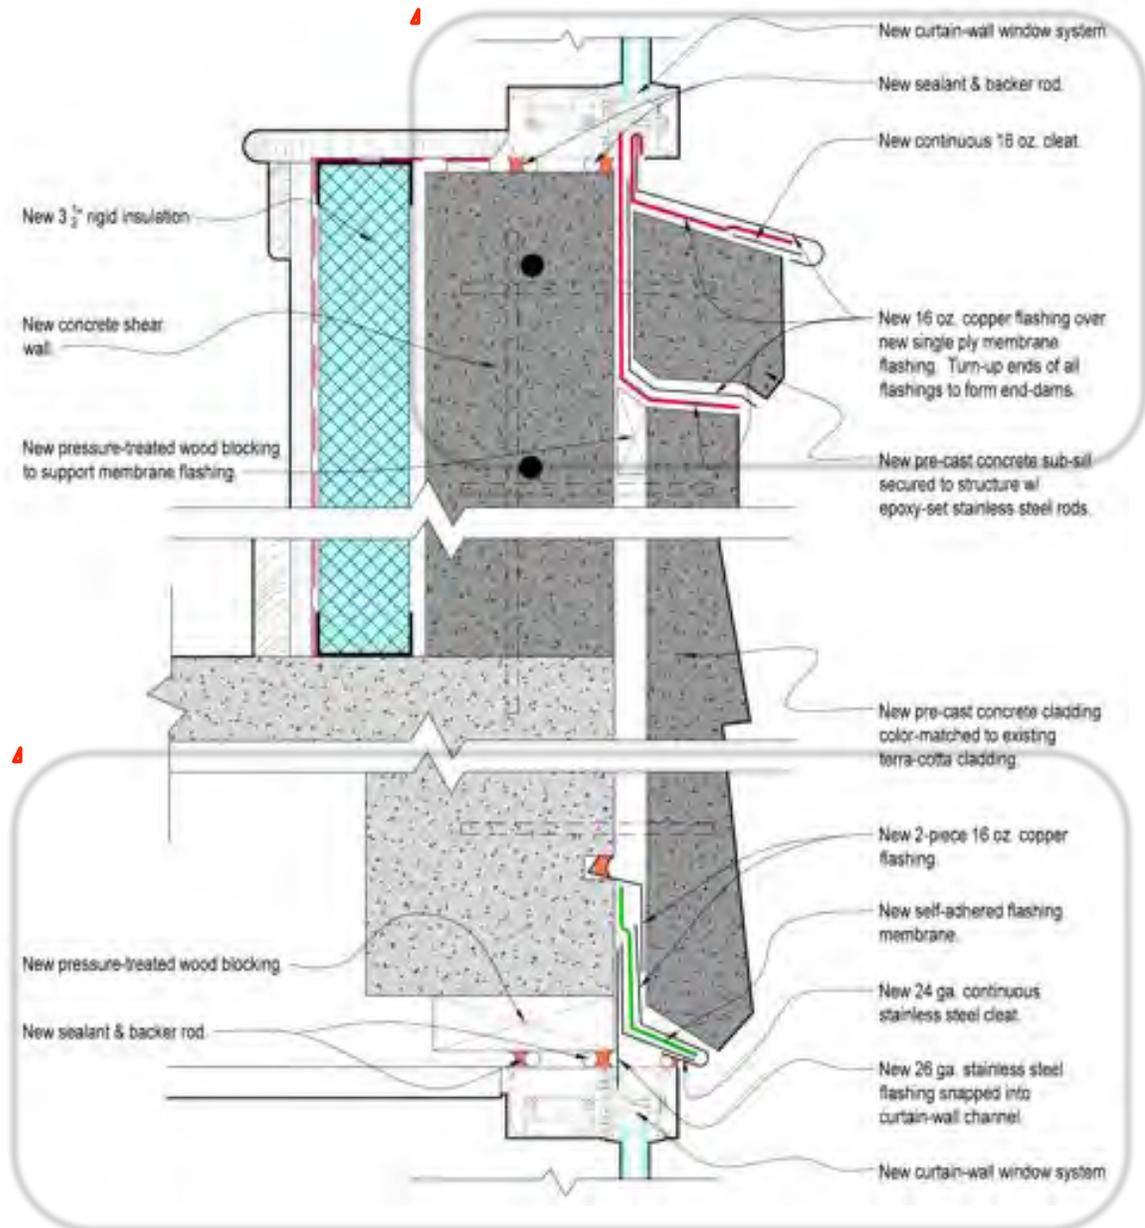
(1): Window Head & Sill Installation at Typical Cladding Panel Loc.
